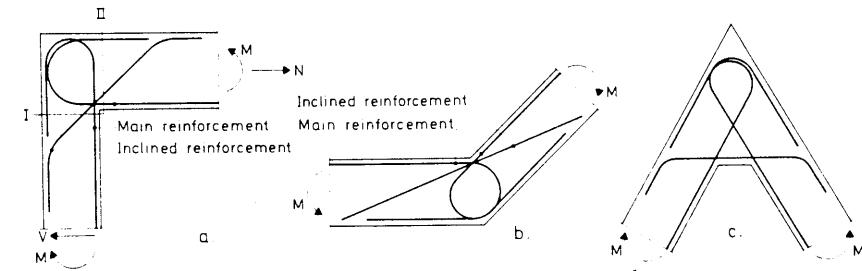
Layout of Reinforcement in Right-Angled, Obtuse-Angled, and Acute-Angled Frame Corners Subjected to Positive Moment
